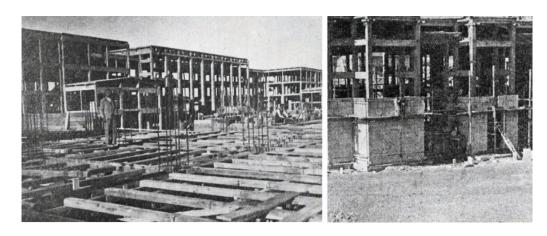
Construction site of the 3rd Assembly Building of Turkey. (Source: Bayındırlık, 1944 and 1947)
